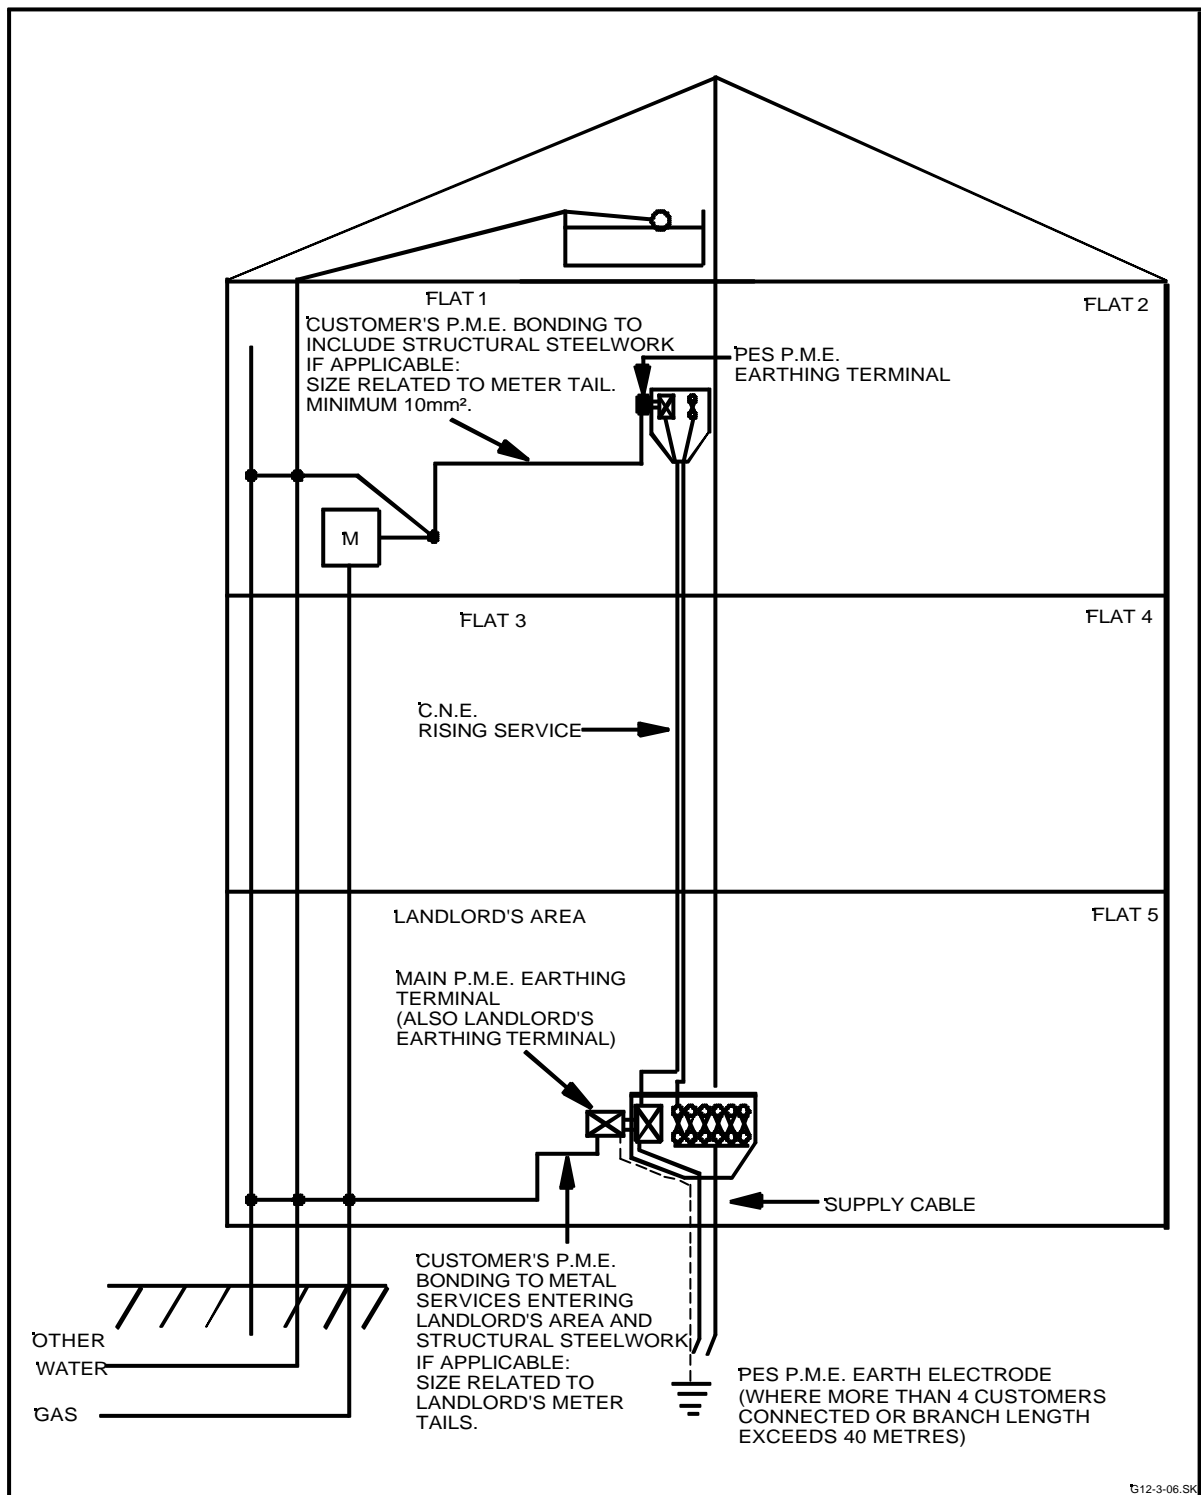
New Multi-Occupied Building with CNE Rising Services: Meter Positions
